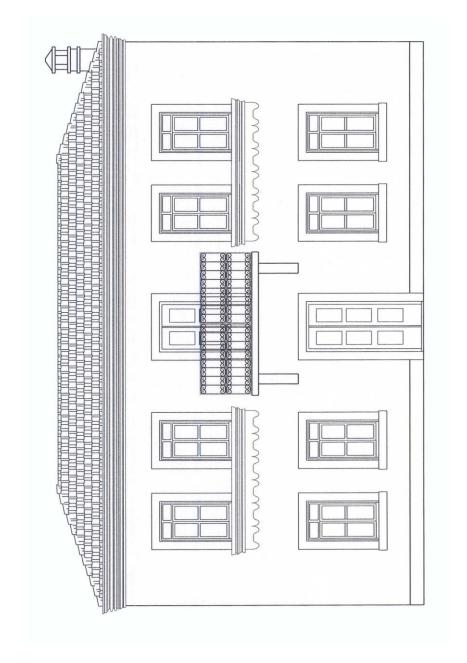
Front Elevation of 1-Artemis Street Scale: 1/75
